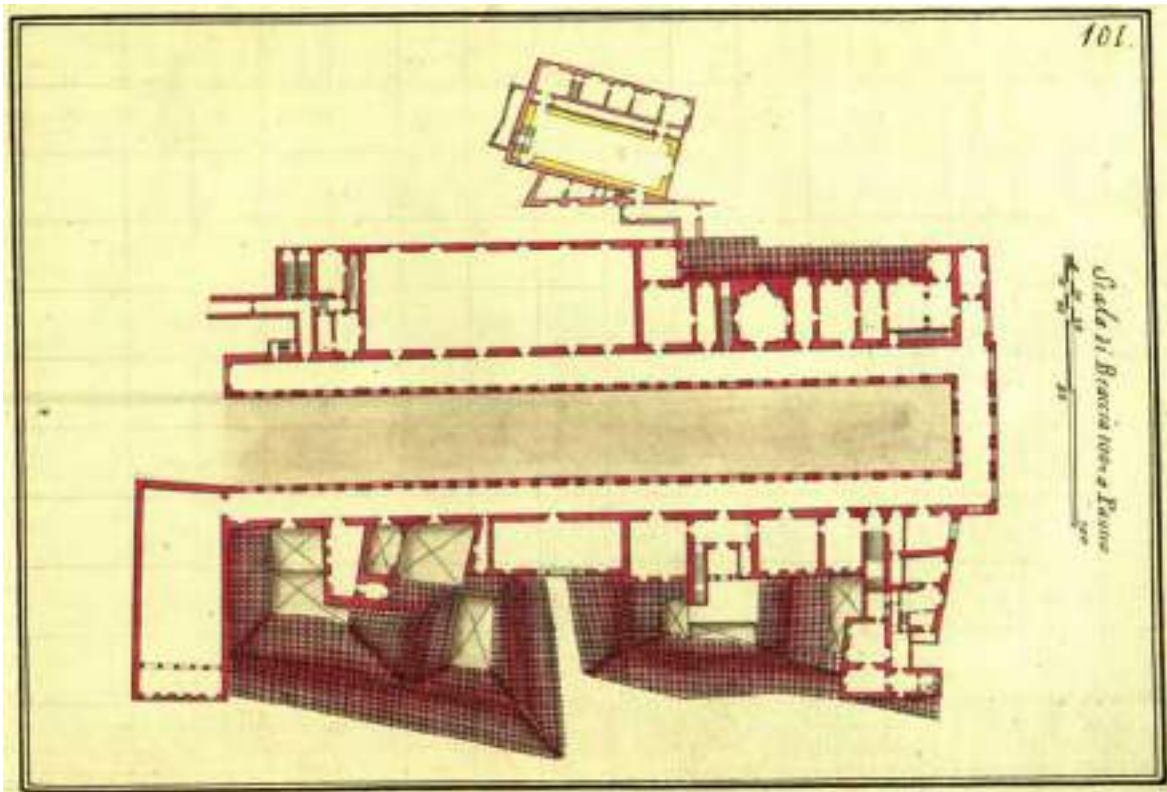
Plan of the Gallery at the second floor (Praga, Národní archiv, fondo Archivio Familiare degli Asburgo di Toscana, Mappe e piante, B.A. 49, c. 101).
